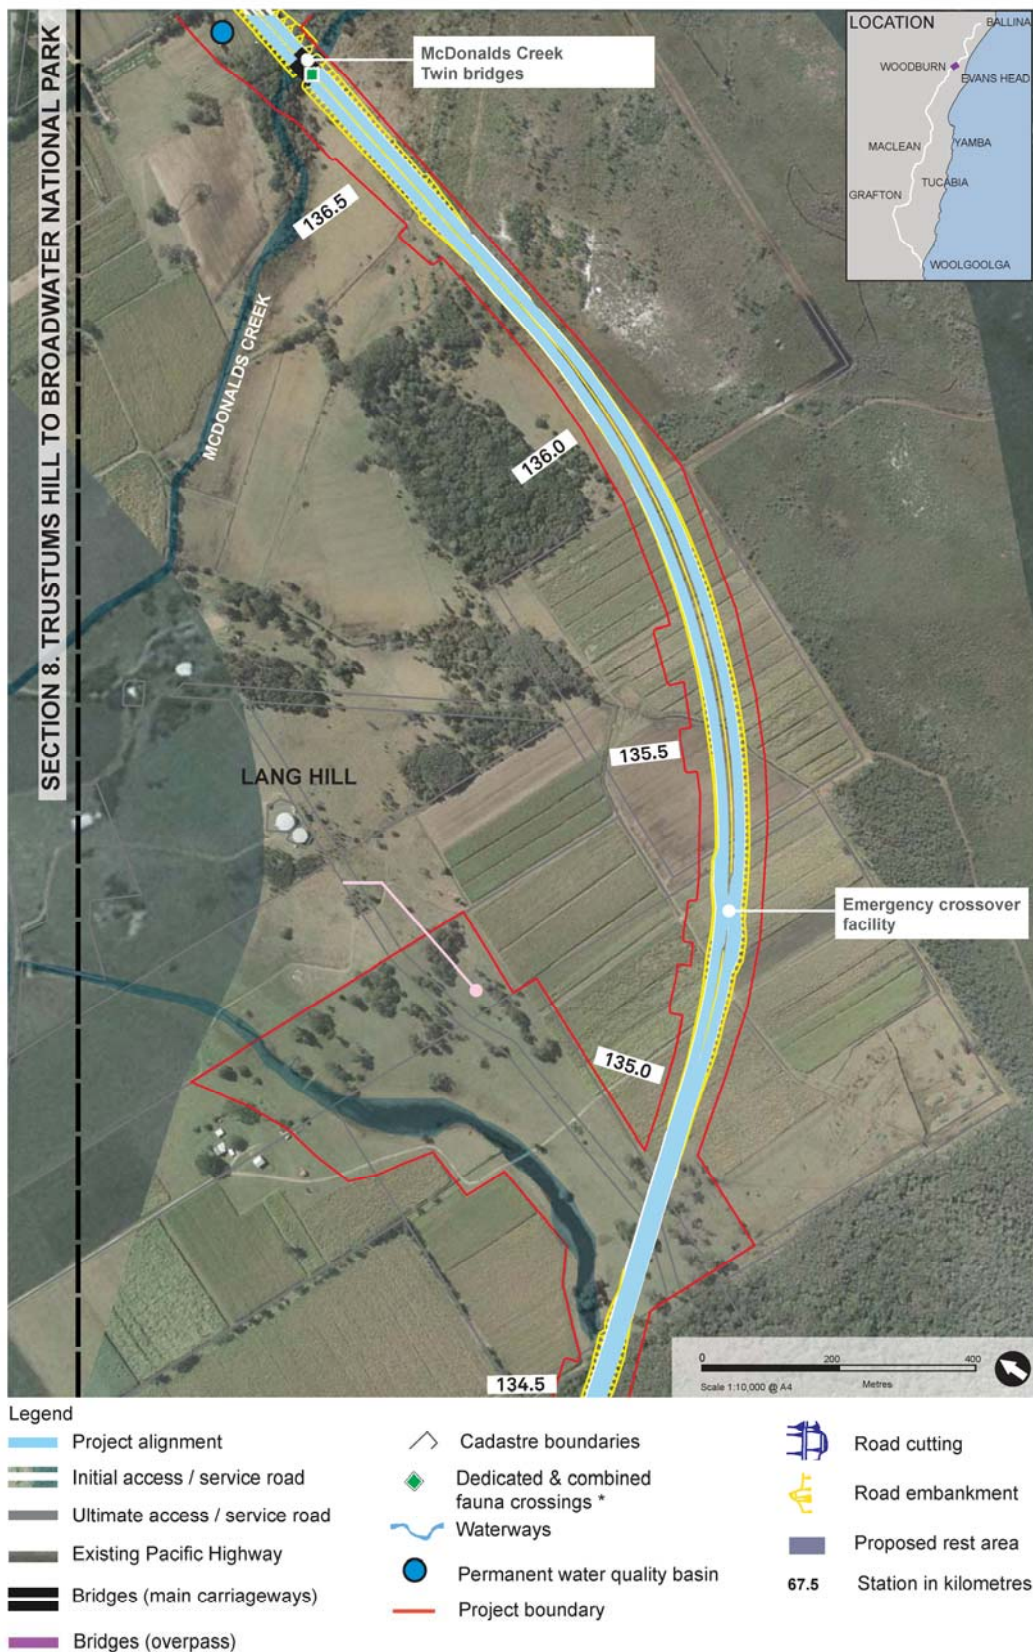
The project: Section 8 (Station 134.5 to 137.0)
